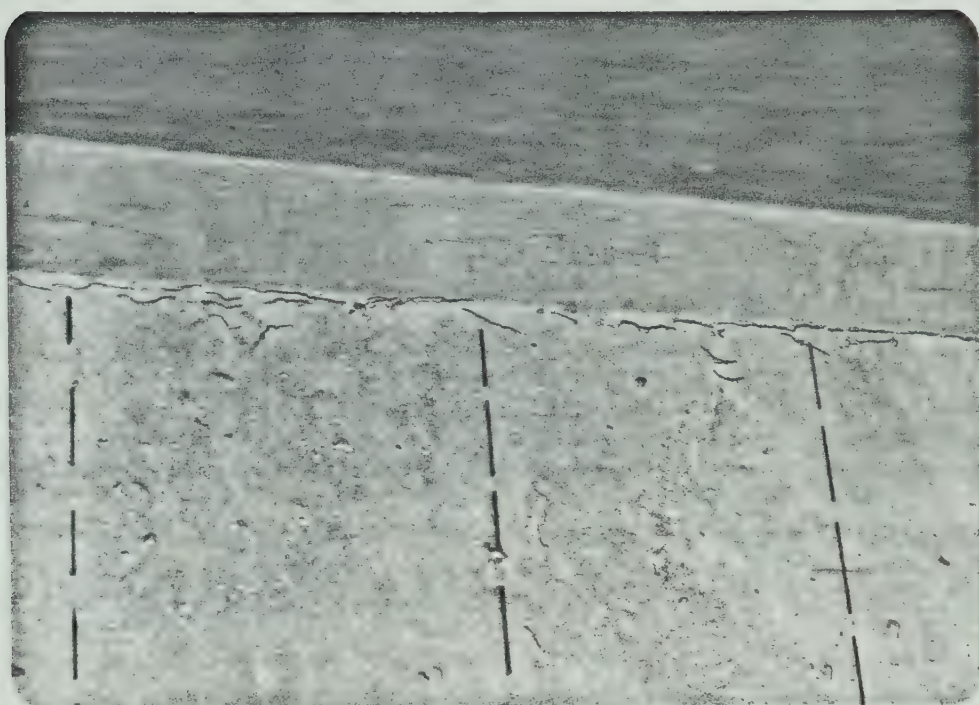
Typical shrinkage cracks at bottom of web-to-flange taper
